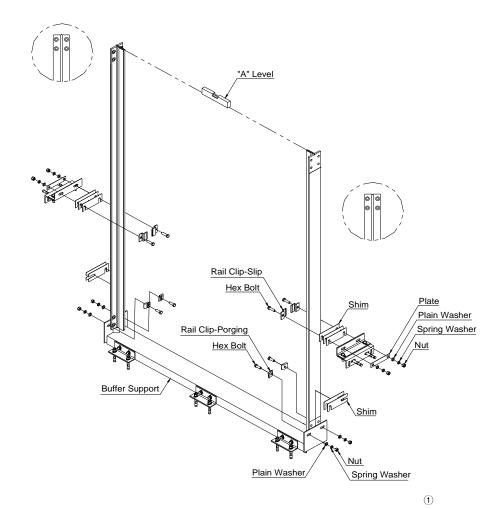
A. BOTTOM GUIDE RAIL INSTALLATION TYPE "A"
